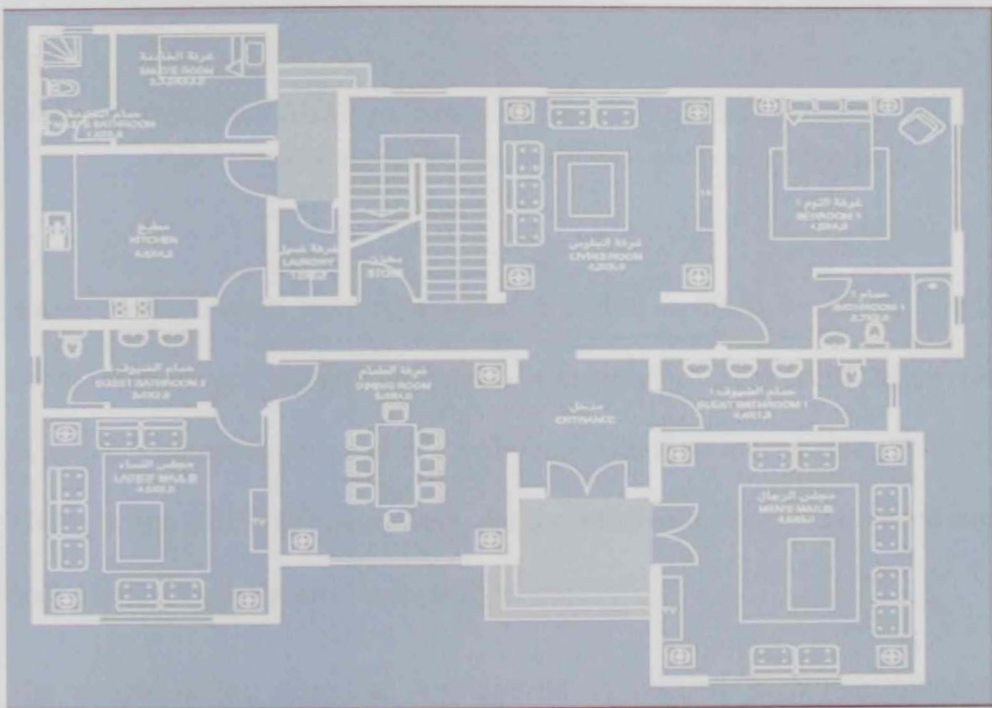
SZHP, Ground floor Plan of Sample Houses, (Source: SZHP, 2013)
